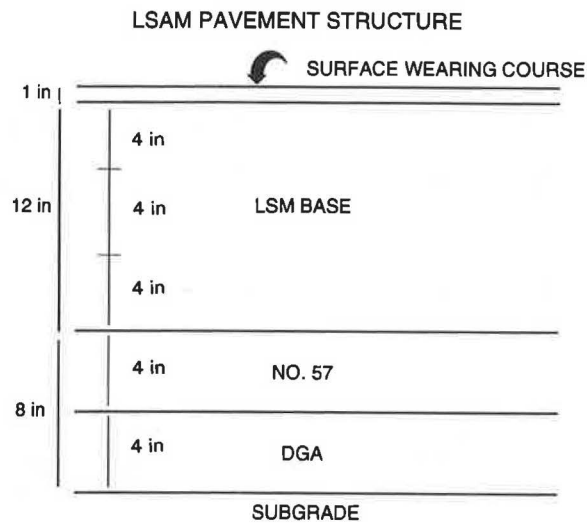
Pavement cross section, US-23–Louisa Bypass.
